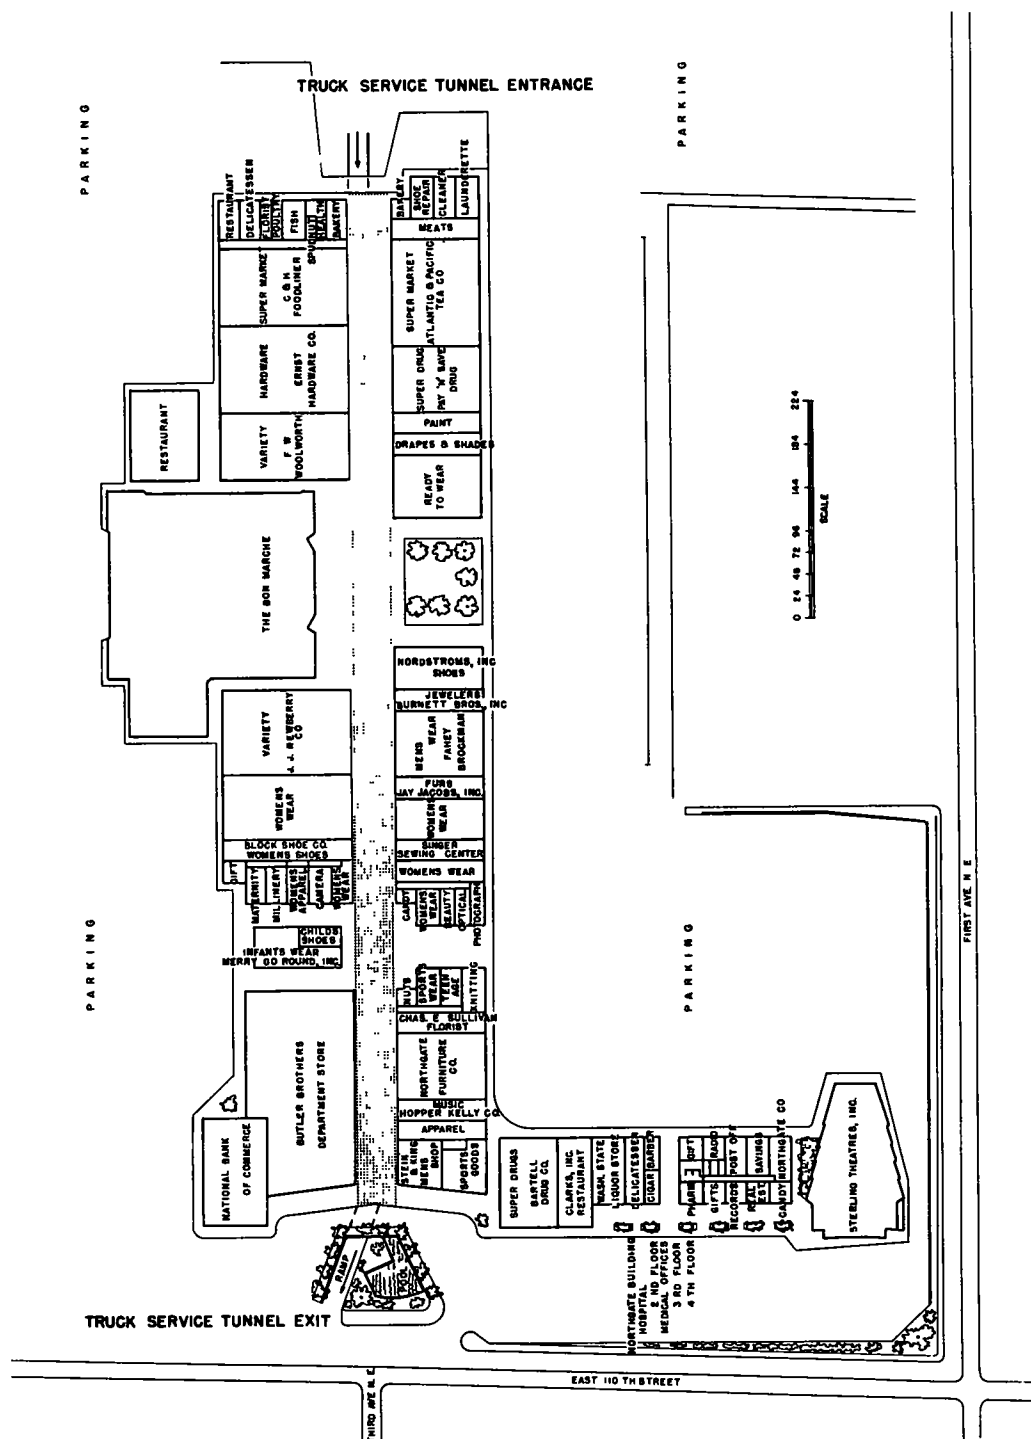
Plot plan of the Northgate Shopping Center, Seattle, Washington. The truck service tunnel serves 80 retail stores as well as a theater and office building. --Courtesy John Graham & Co., Architects and Engineers, and The Northgate Company.
